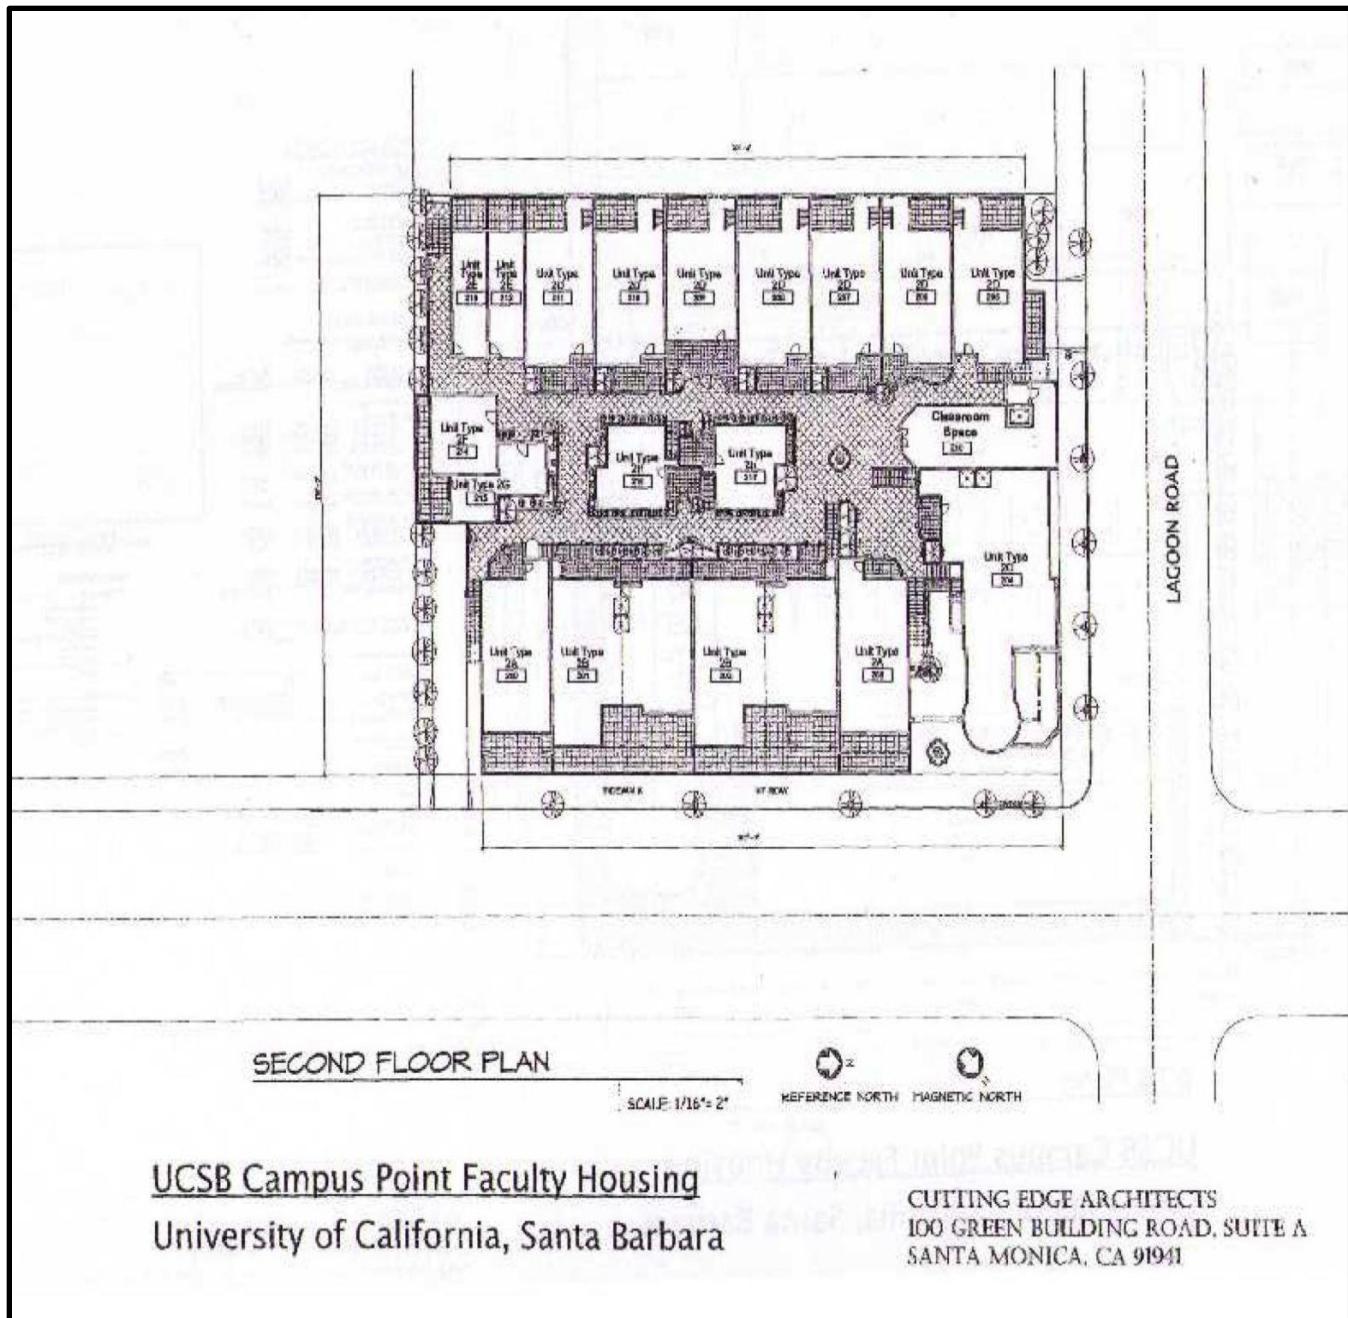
Second Floor Plan of UCSB Campus Point Faculty Housing
